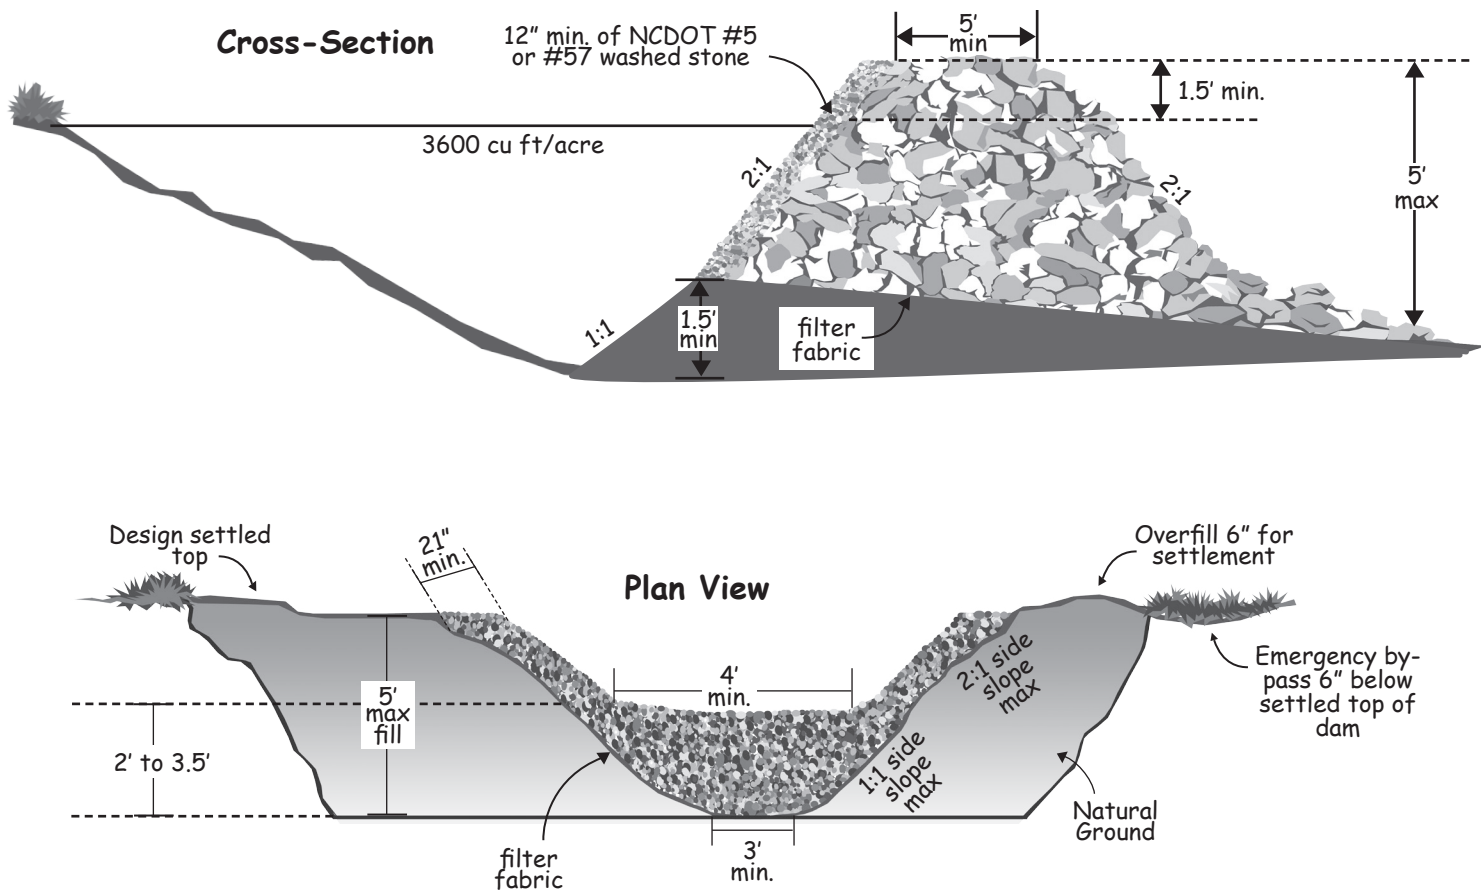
Plan view and cross-section view of a temporary sediment trap.
